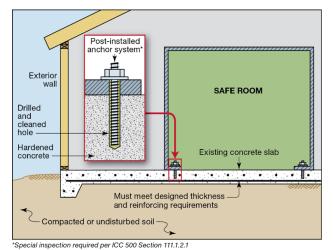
Existing concrete slab foundation that has been evaluated to meet the requirements of FEMA P-361 and ICC 500 Section 307
